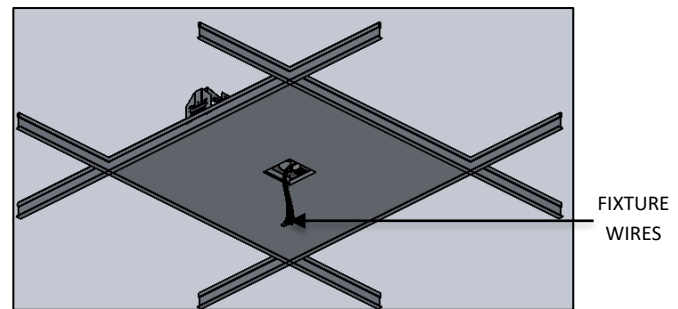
ASSEMBLED VIEW SHOWING RECESSED J-BOX TO THE CEILING
